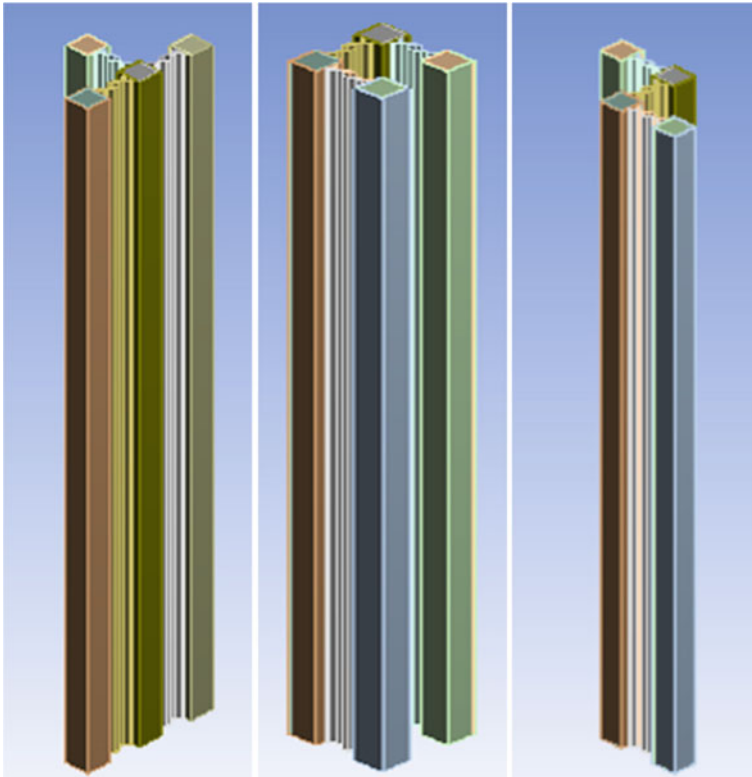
Geometry of T-shape, C-shape and Z-shaped CFST columns connected with corrugated plate
